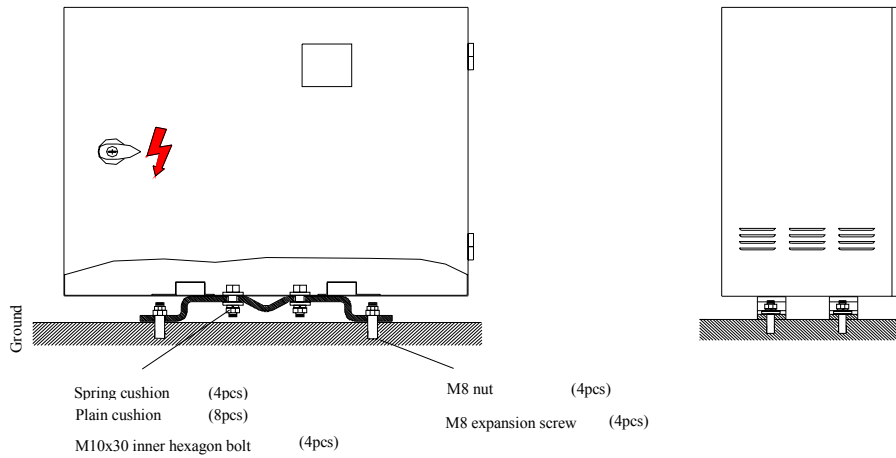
Frontal and Lateral Faces of the UPS's Floor-type Installation
